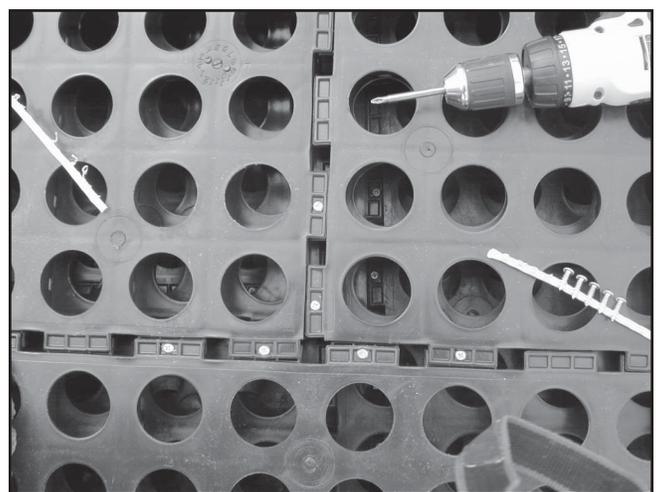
Illustration of the tab-fastening screw pattern at panel joints.
